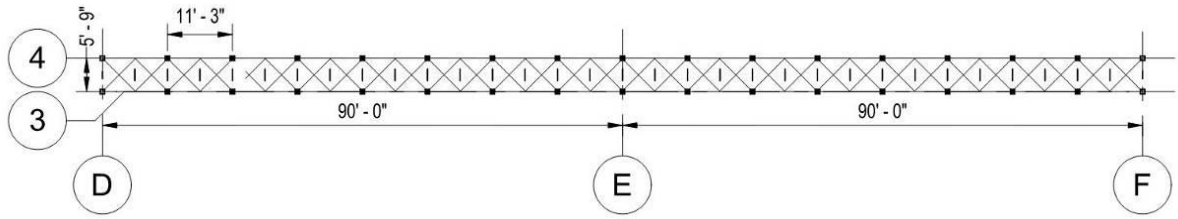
TRUSS BRIDGE PLAN, SPAN 180'
